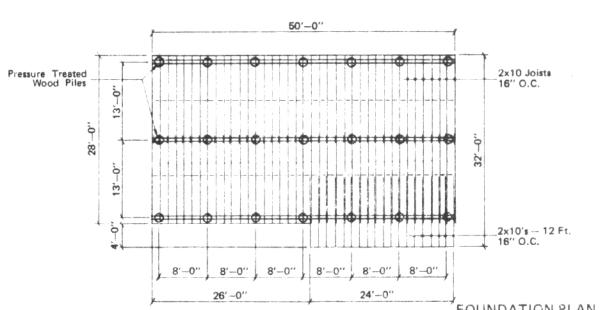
Elevated Foundations (Estimates are spring 1983.)
